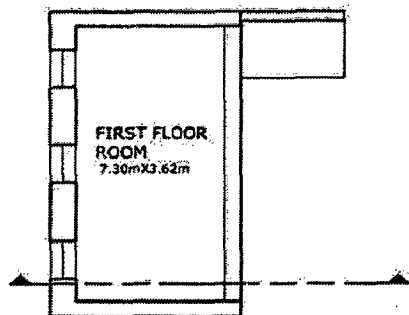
First floor plan of residence 2 in Kizhakkencherry Agraharam
